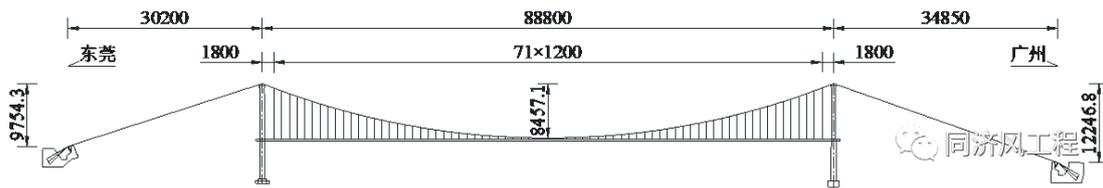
Schematic diagram of structural layout of Humen Bridge (Unit: cm)
